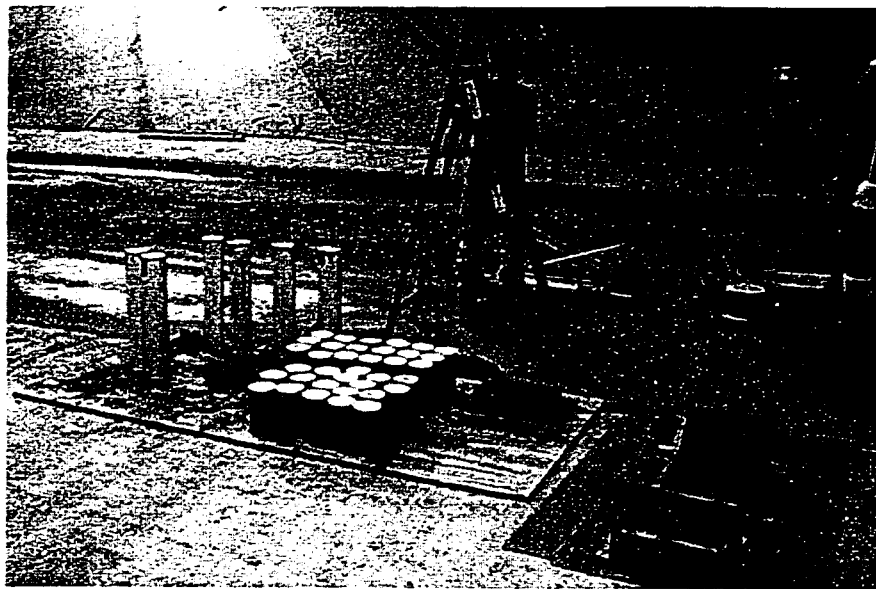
C/S/T Specimens Just After Casting at Jobsite
